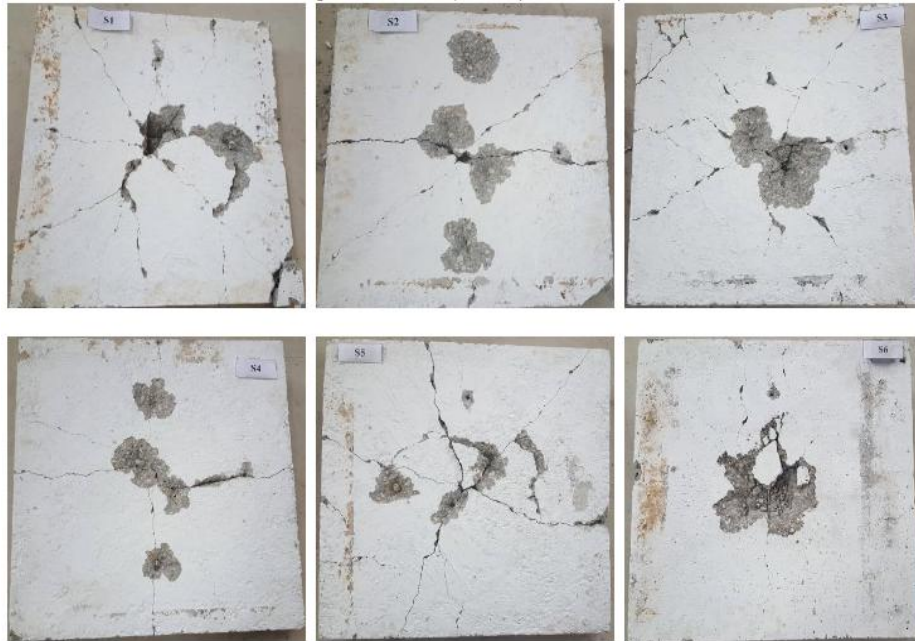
Failures of Test Specimens (Erdem, 2021)
